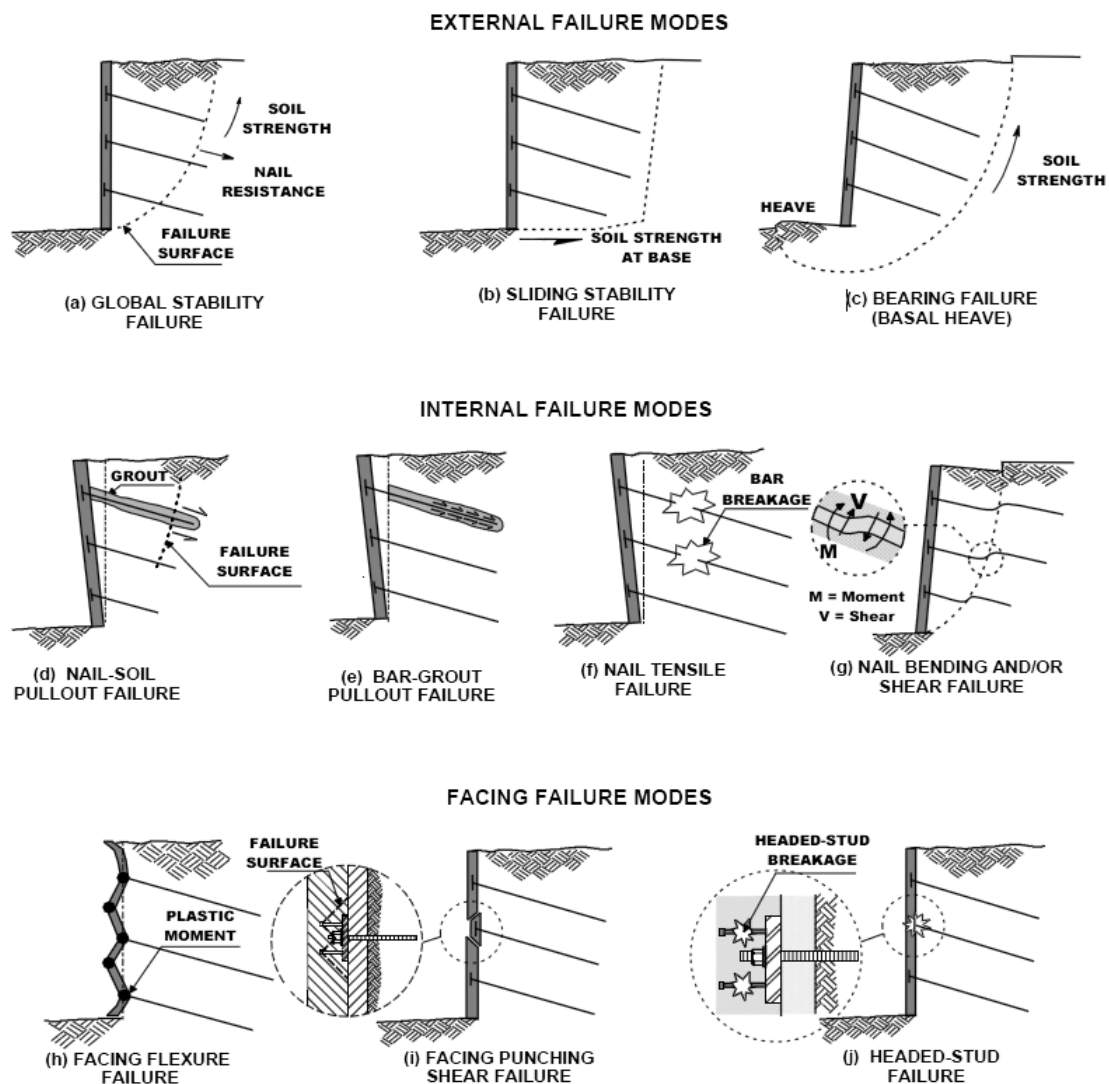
Potential failure modes of soil nail walls (FHWA, 2003)
